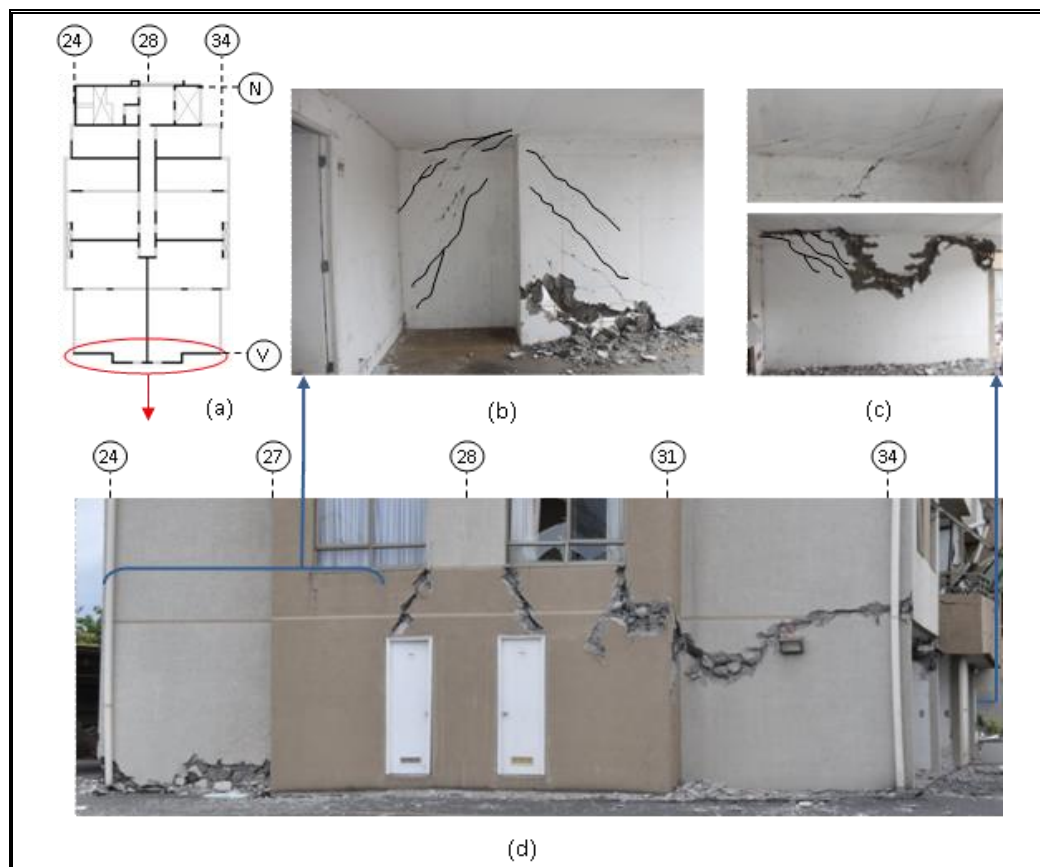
Building PR-6. (a) Structural plan of 1st story, (b) shear damage propagation through the slab, (c) zoom of damaged slab and superimposed flexural and shear stress cracking. (d) Multistory damage.
